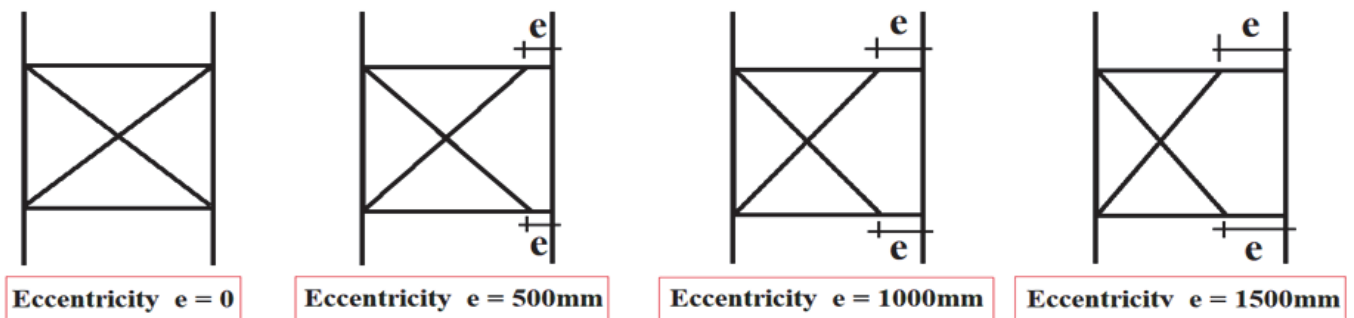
Alternative eccentricity of bracing arrangement of EBF's of steel buildings.
